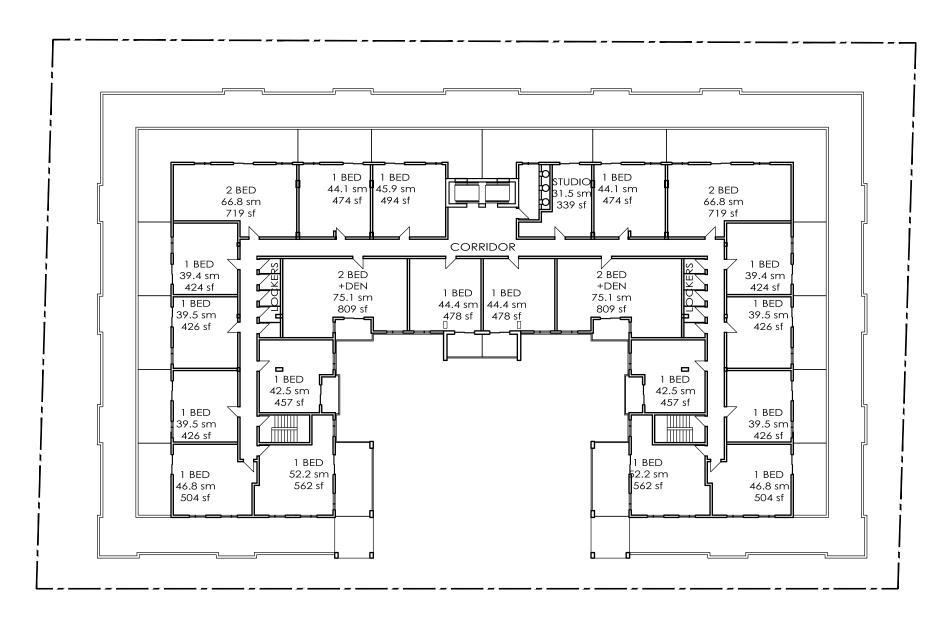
Fifth Floor Plan prepared by Lintack Architects Inc.
